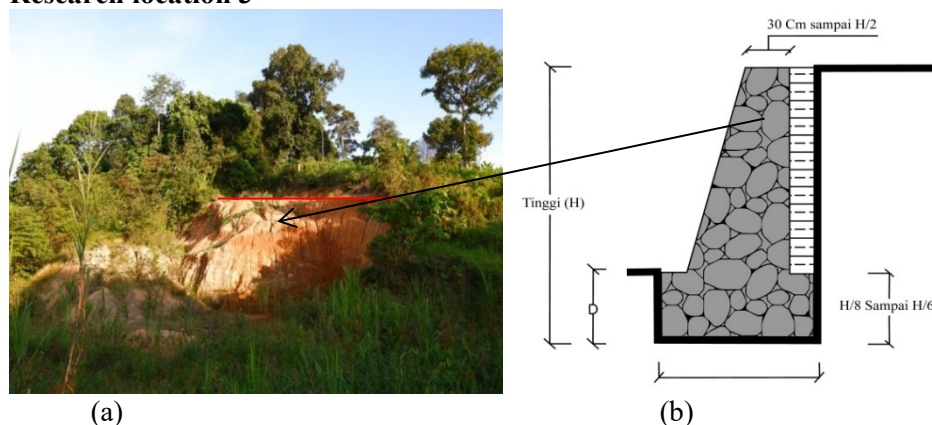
(a) The condition of the excavated land; (b) Retaining wall.
